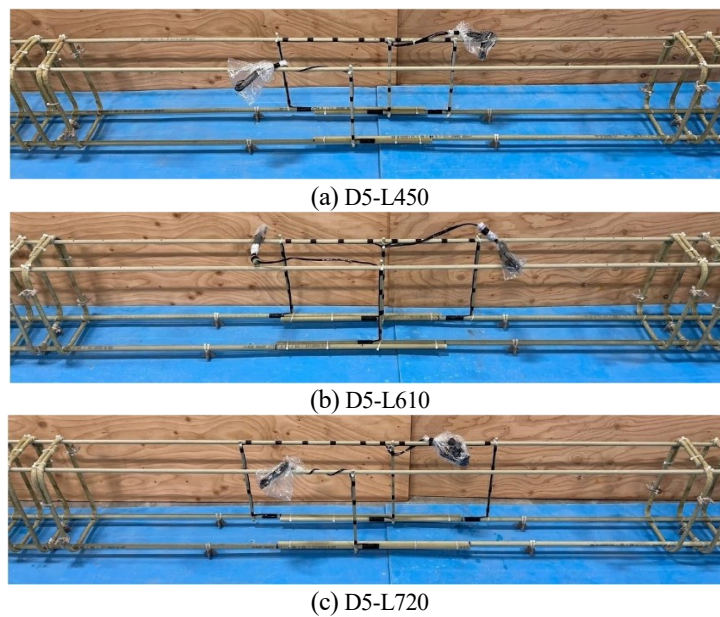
Reinforcement arrangement of lap spliced beams with different splice lengths
